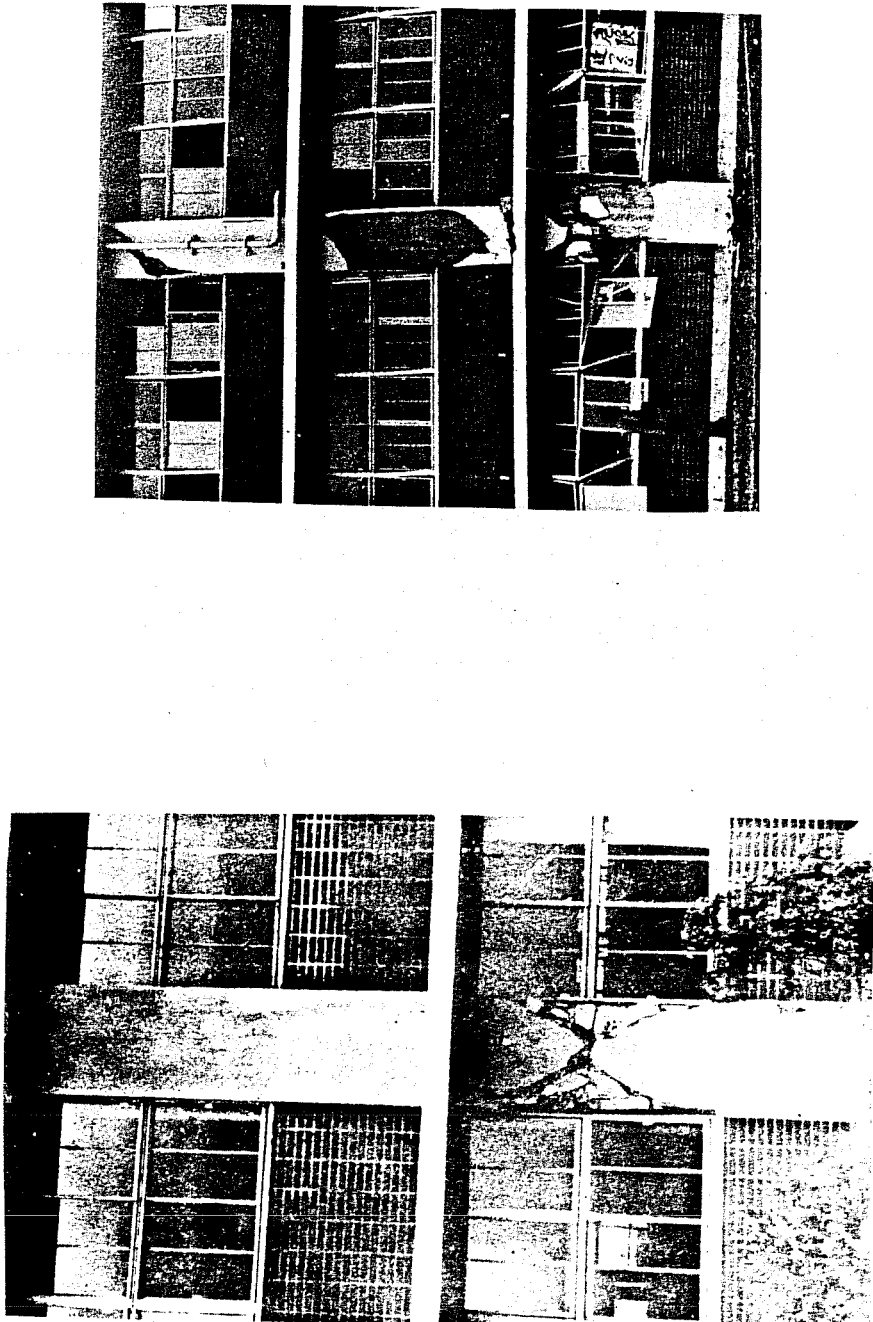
Failure of short columns, Tokachi-Oki earthquake, 1968
